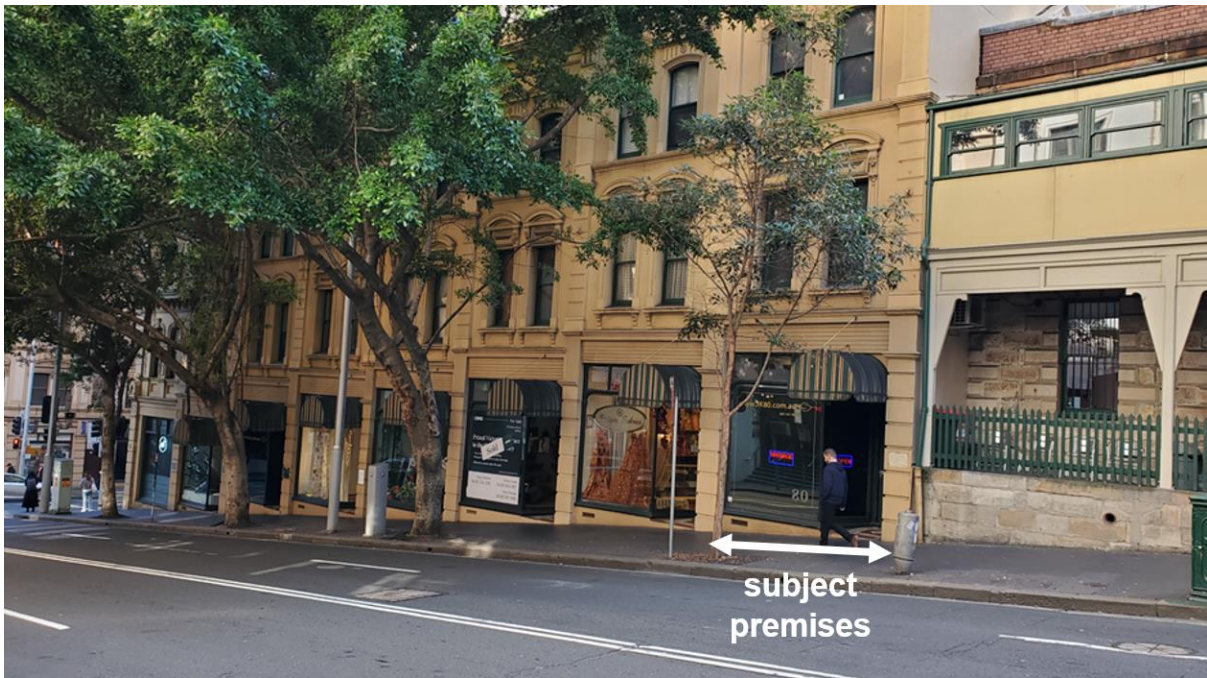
Collective site (68-80 Erskine Street), and the subject premises, as viewed from Erskine Street facing northwest
